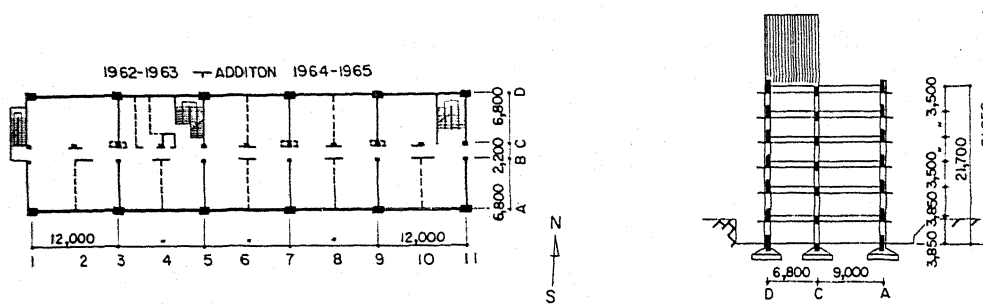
PLAN AND SECTION OF THE TEST BUILDING
